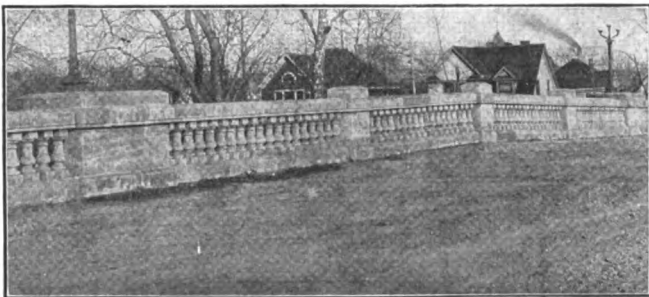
ROADWAY SUMMIT AND CONCRETE BALUSTRADE, COOMBS ST. BRIDGE
